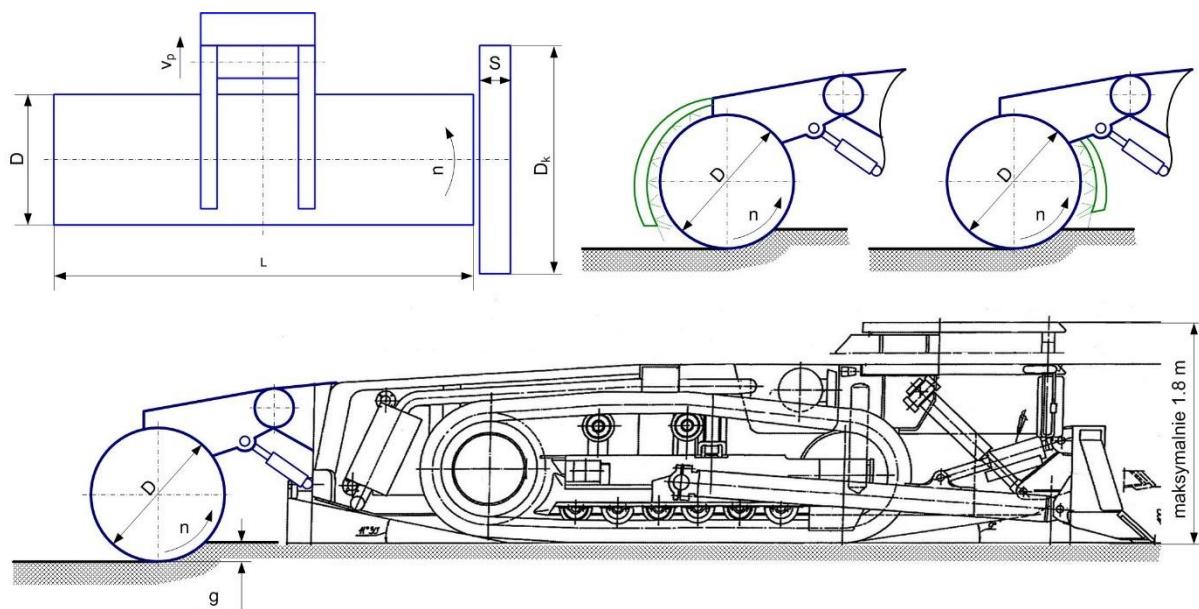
Concept of a cutting head to maintain the technical condition of the road bottom in a copper mine (Bołoz, 2025): a. Diagram of the cutting head, b. proposals for sprinkler systems, c. cutting head installed behind a crawler dozer
